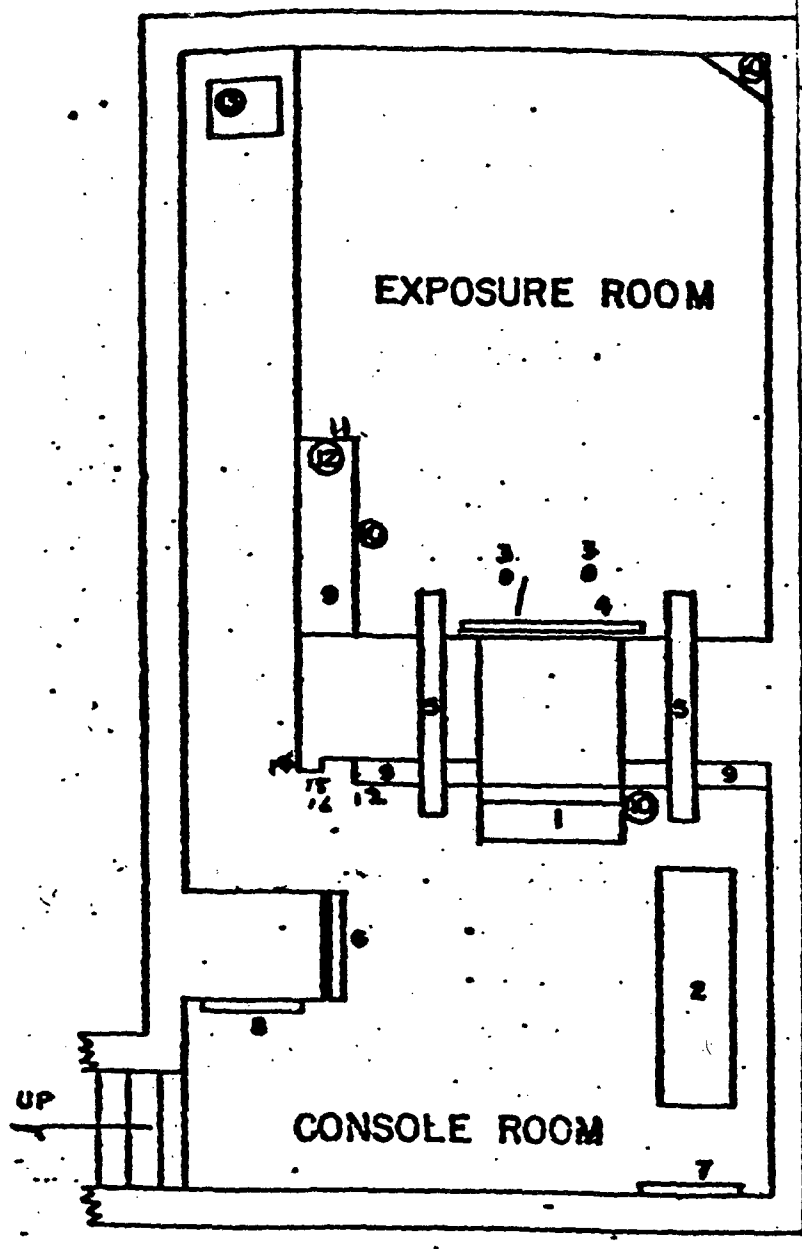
ELEVATION VIEW UNDERGROUND VAULT
